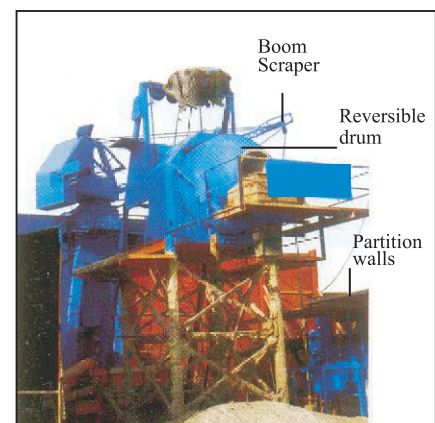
Stationary Concrete Batching and Mixing Plant with Boom Scraper
